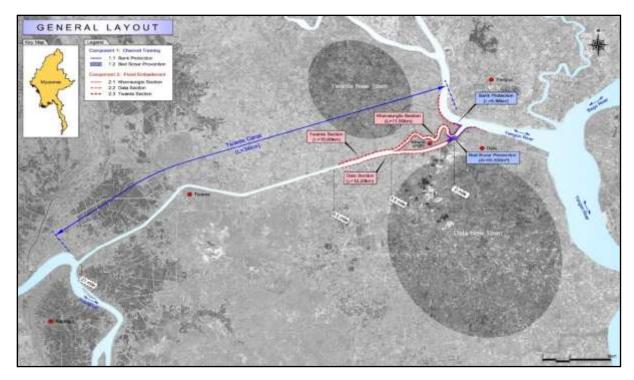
General Layout Plan of Twante (Twantay) Canal
